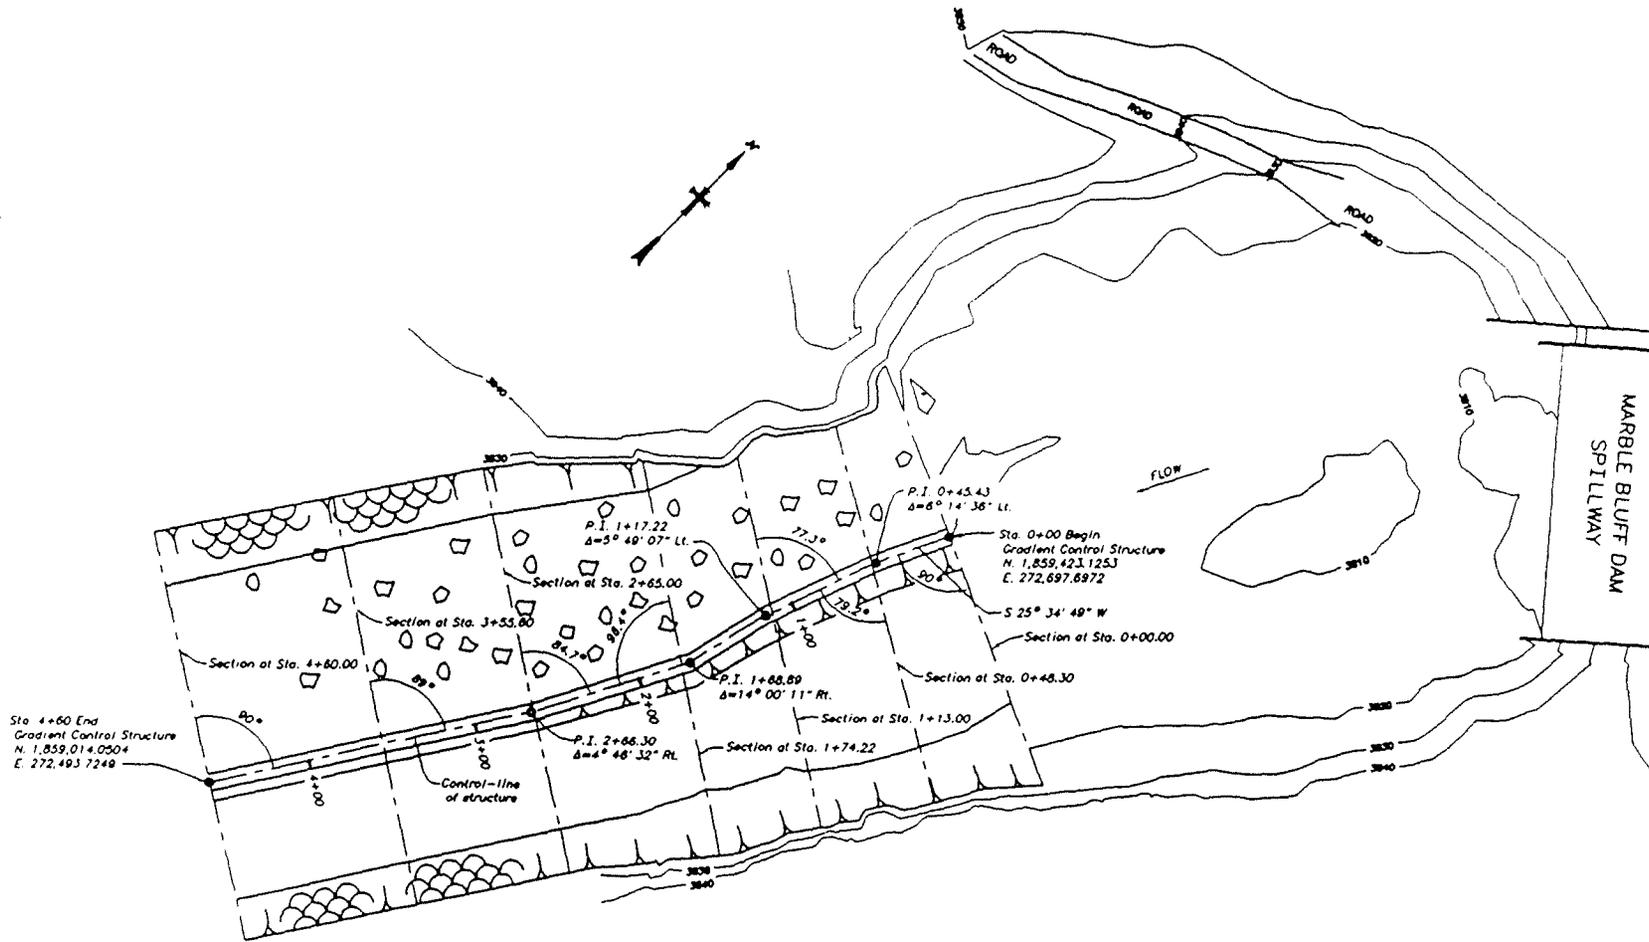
PLAN VIEW - GRADIENT CONTROL STRUCTURE
